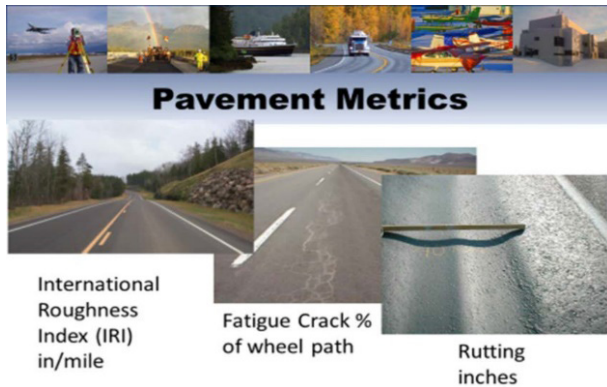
Federal pavement condition metrics for asphalt pavements.
